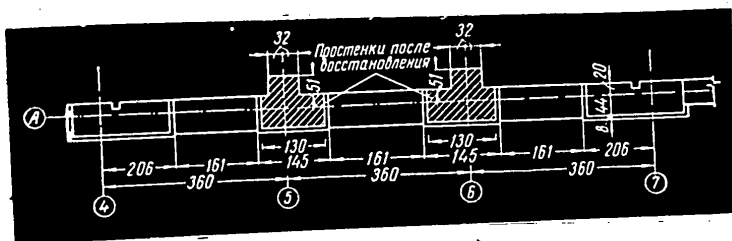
Reconstructed wall piers. Plan of the 1st floor
